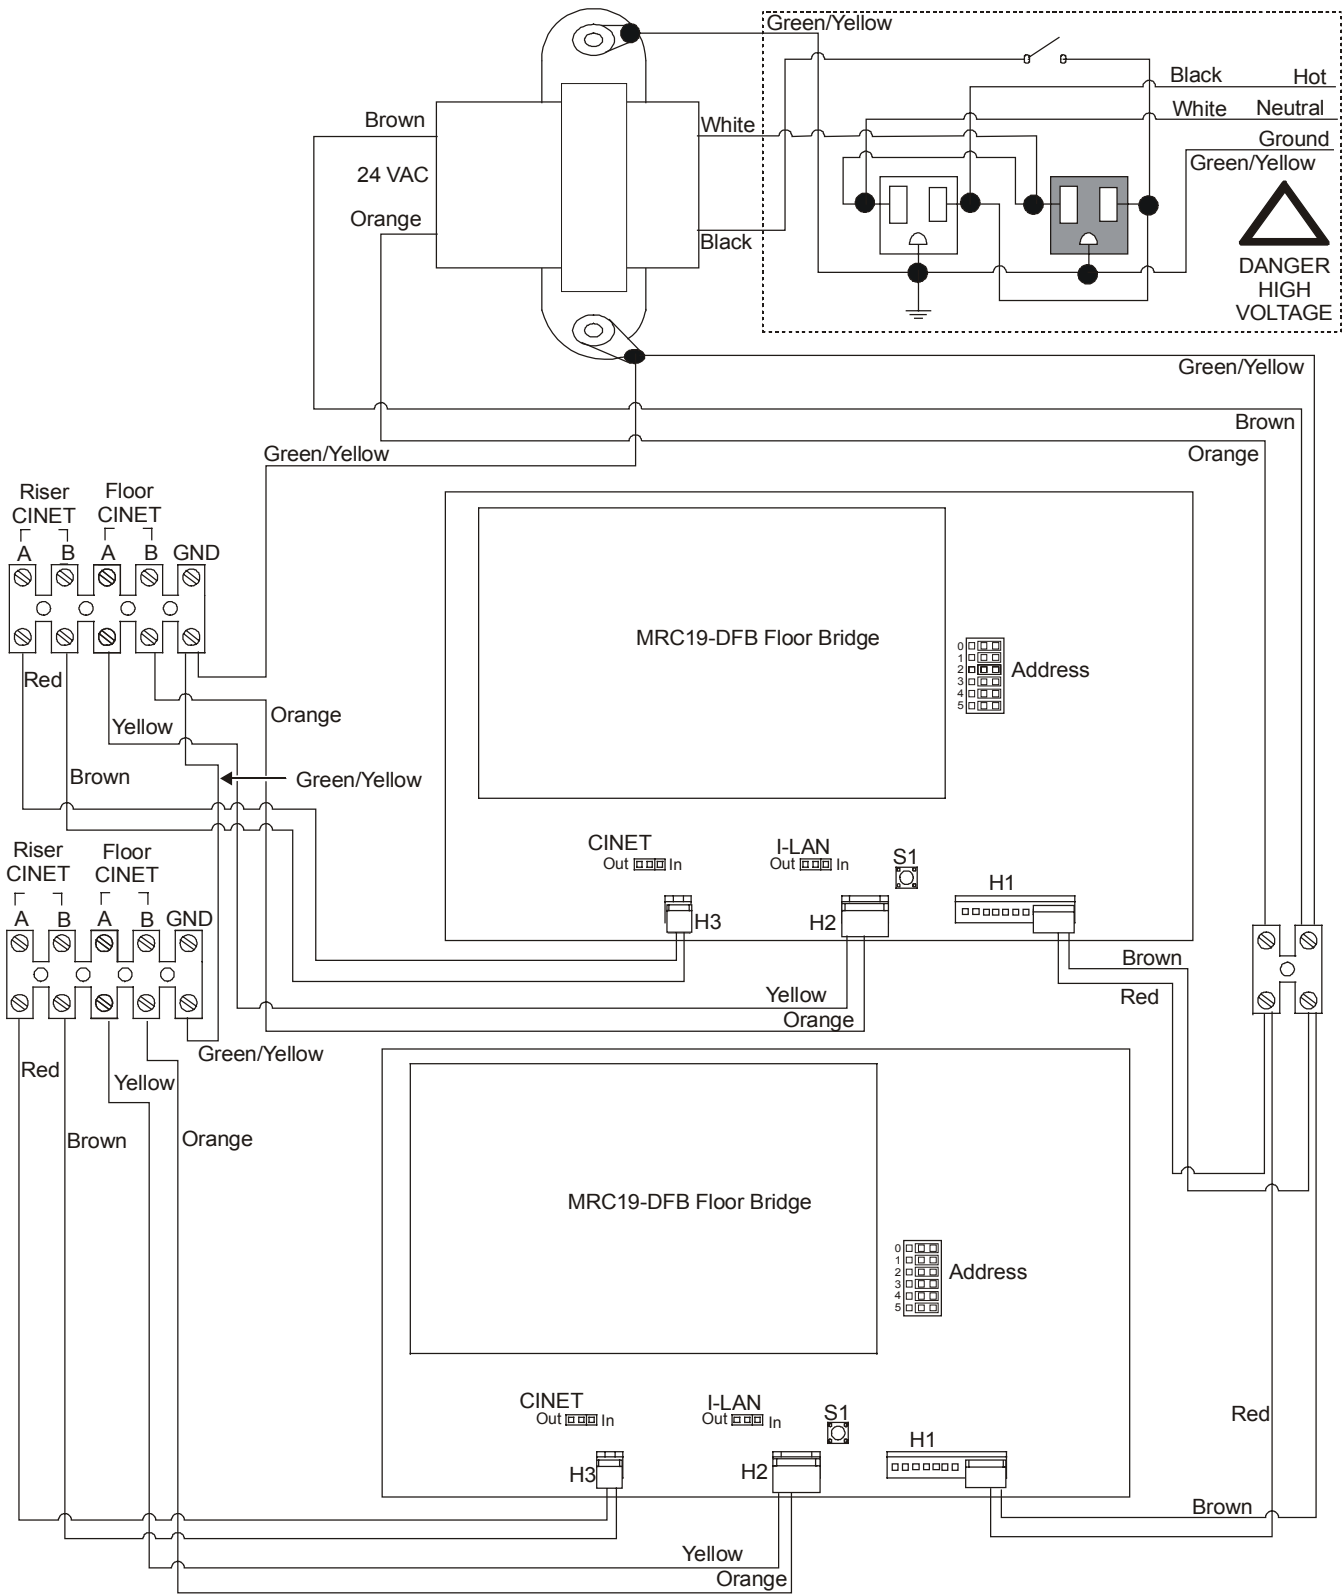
Floor Bridge, Riser Bridge, and CIS Connection
